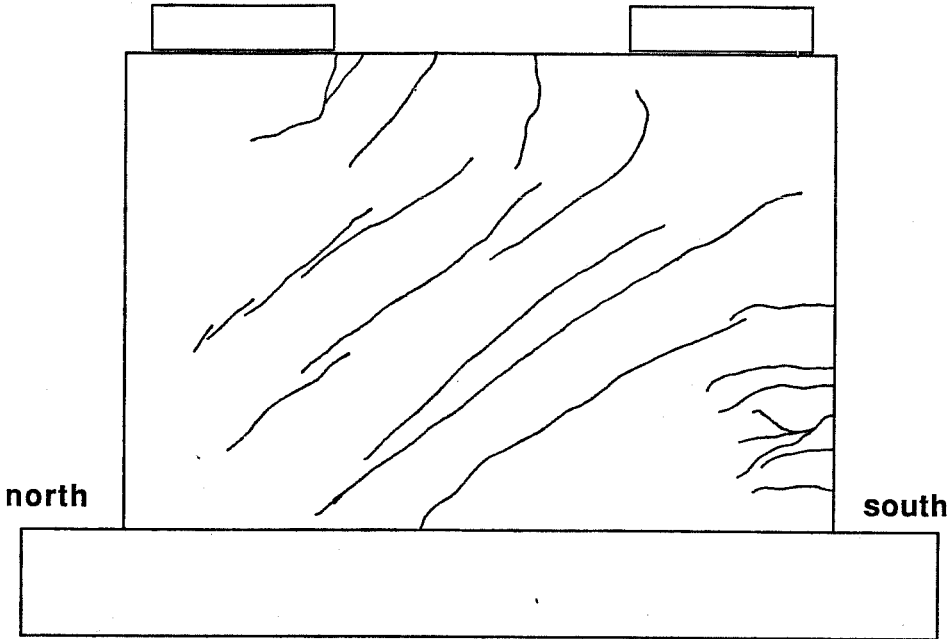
Crack Pattern at 0.1% Drift (Loading North)
